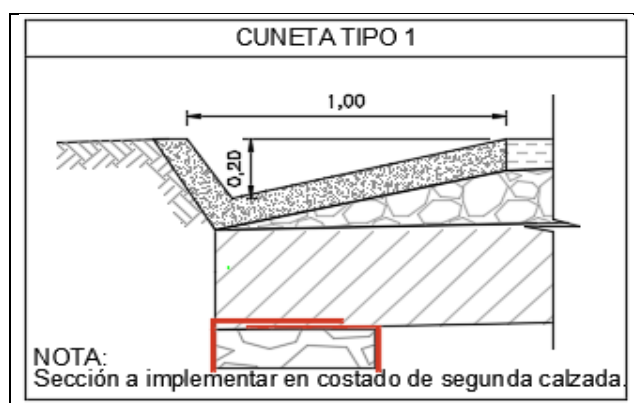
Ditch type 1 drawing UF4 and UF5 Subsector 1
